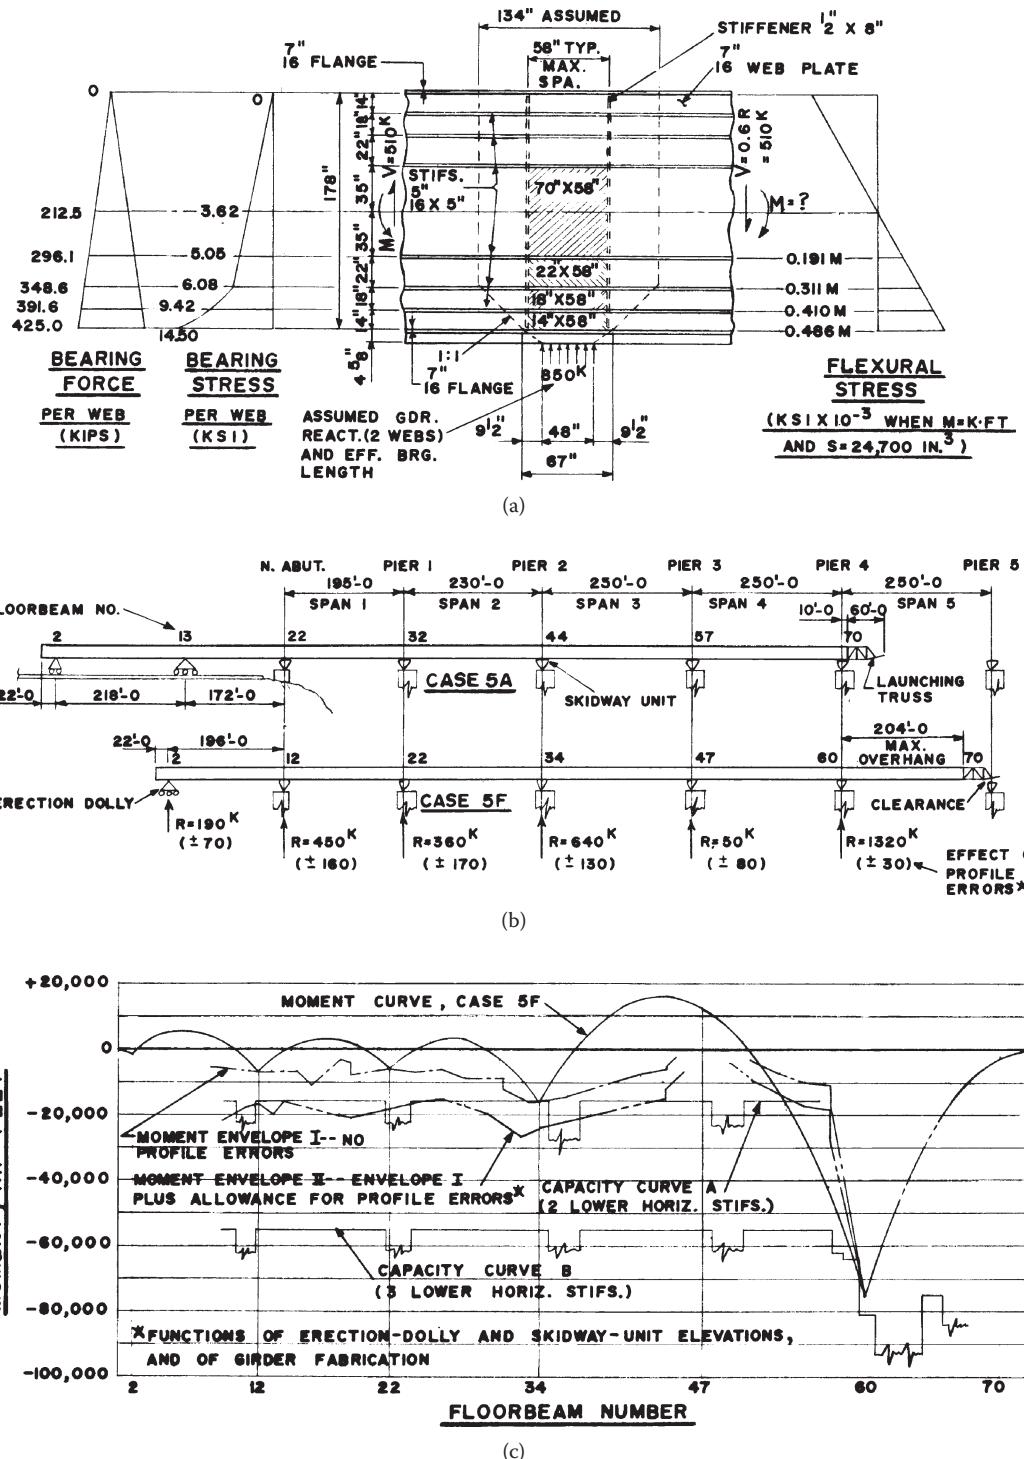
Erection strengthening to withstand launching, Kansas City Southern Railway box-girder bridge, near Redland, Okla. (see Figure 1.41). (a) Typical assumed erection loading of box-girder web panels in combined moment, shear, and transverse compression. (b) Launch of north girder train from pier 4 to pier 5. (c) Negative-moment envelopes occurring simultaneously with reaction, for launch of north girder train to pier 5.
